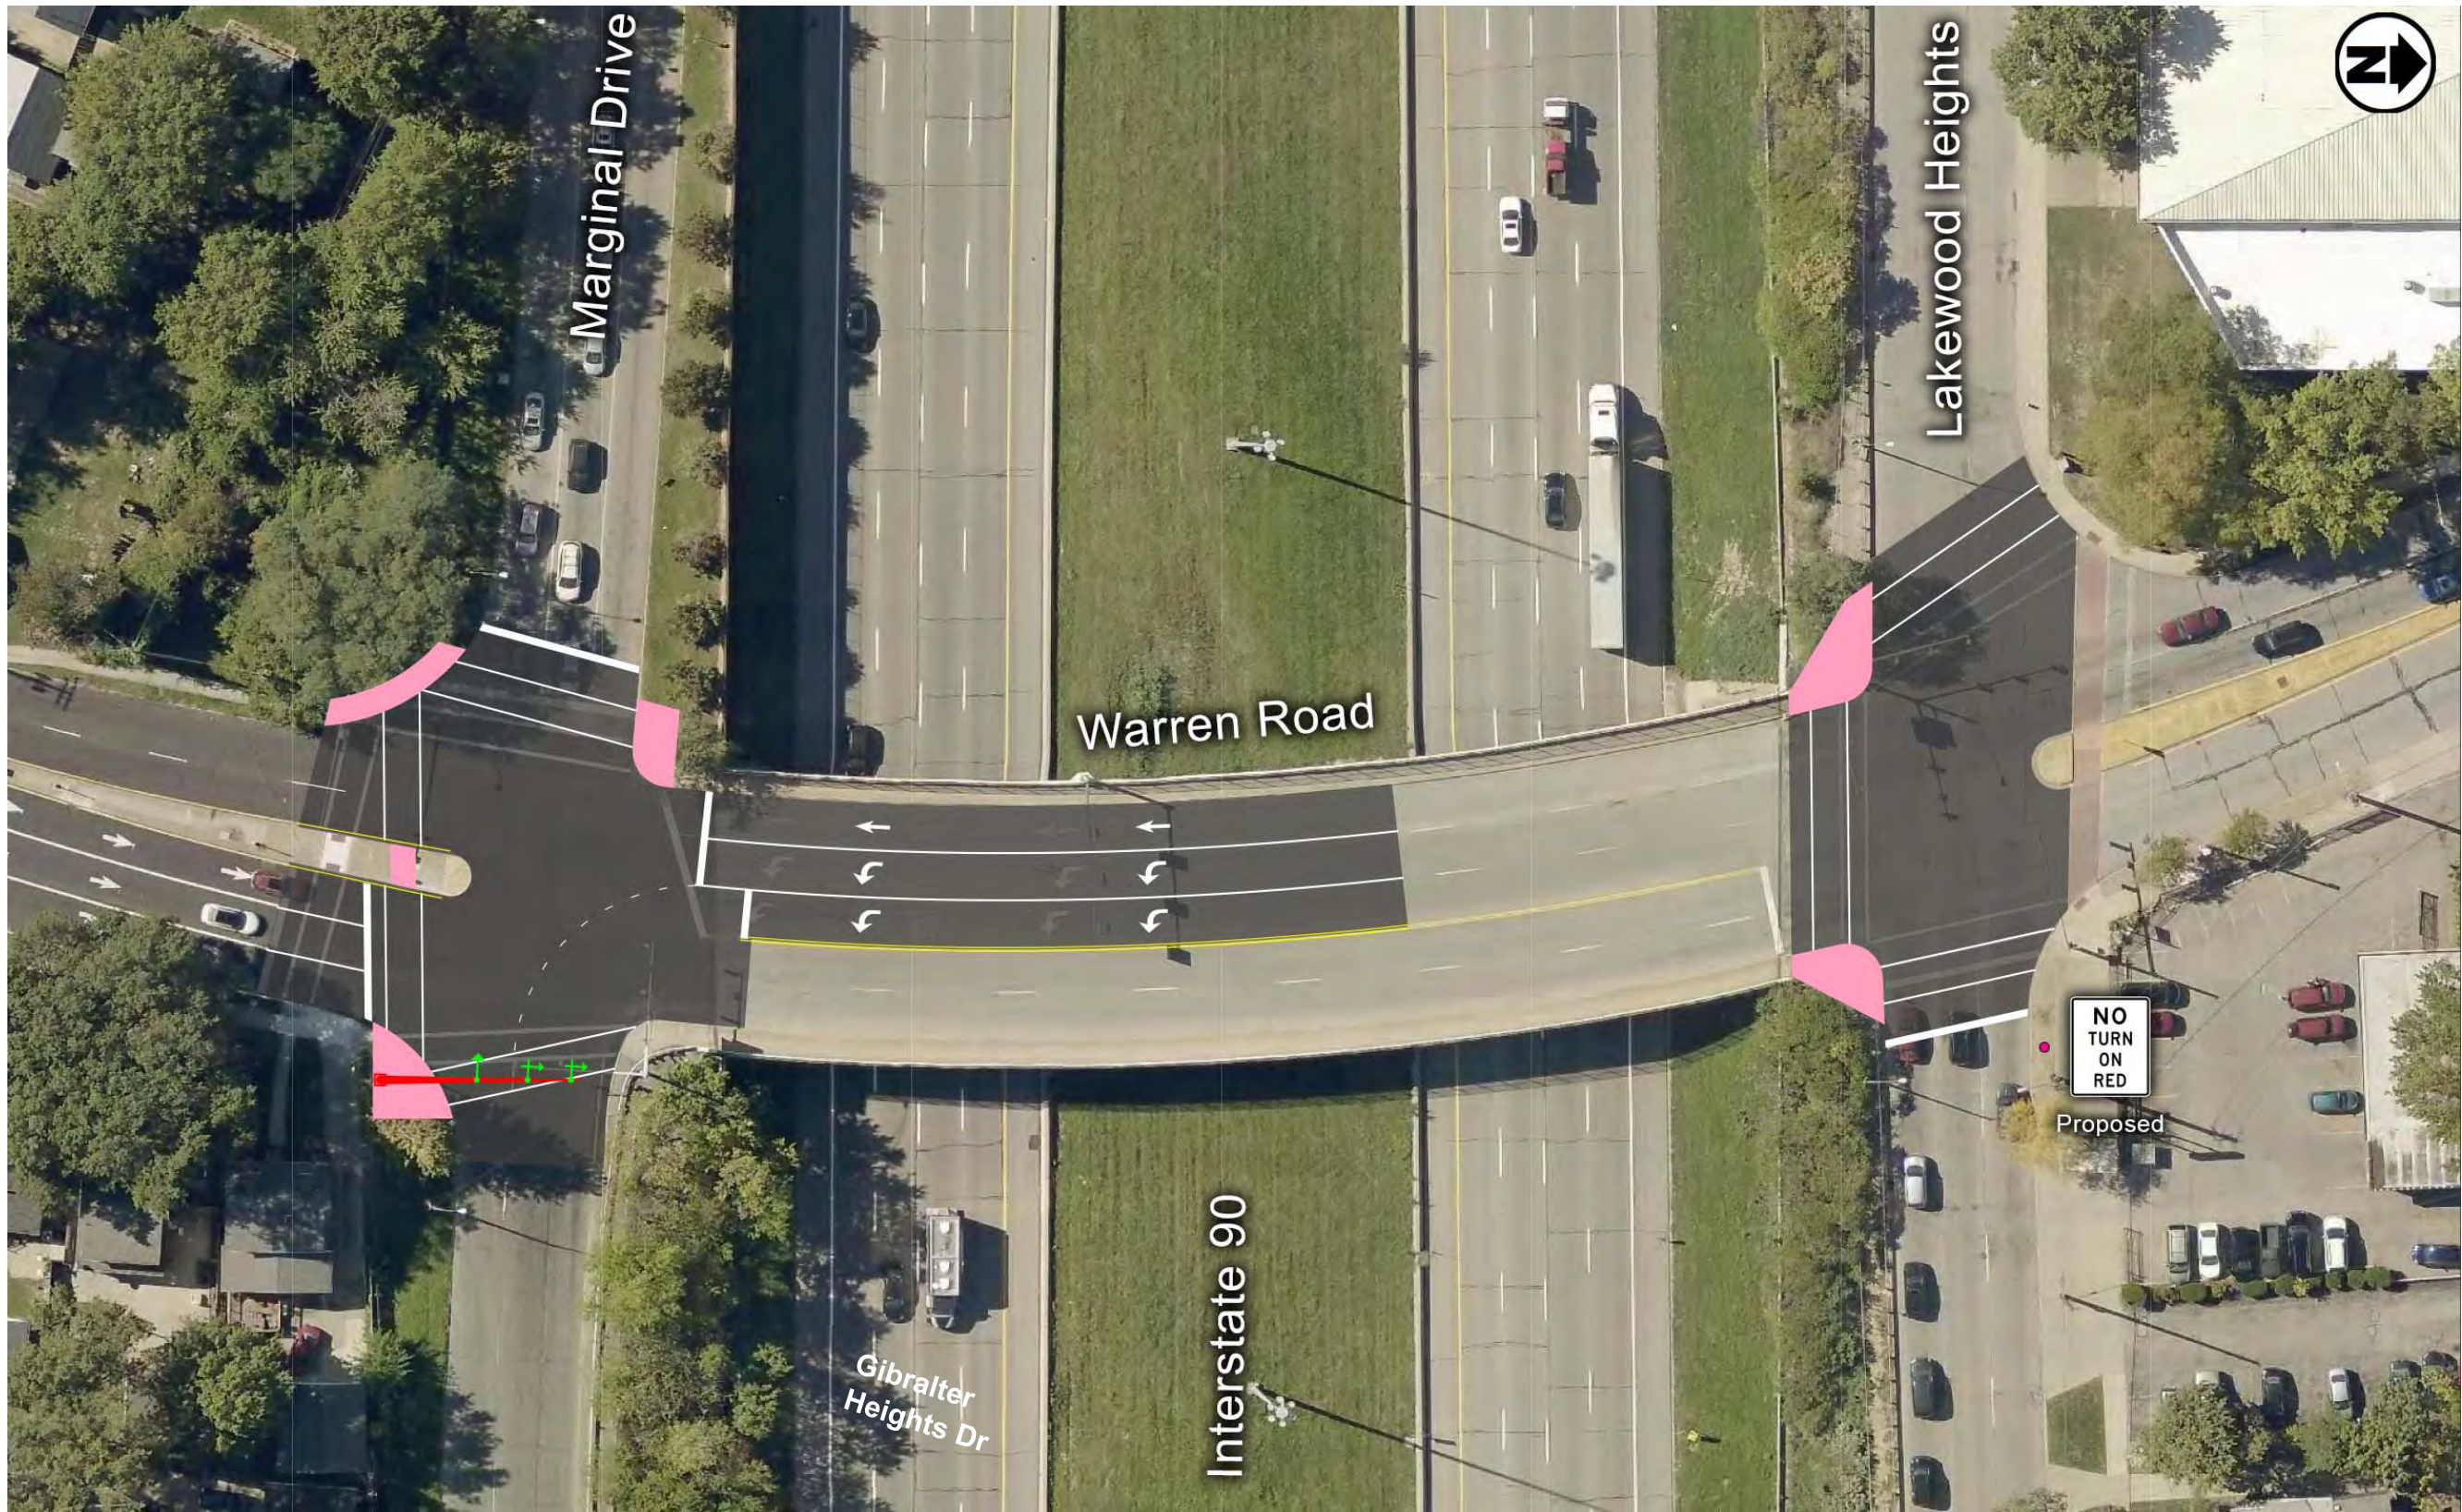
A is a conceptual plan of the proposed improvements at the 2 signalized intersections on Warren Road. The following countermeasures are proposed at the Warren Road and Lakewood Heights Boulevard signalized intersection:
